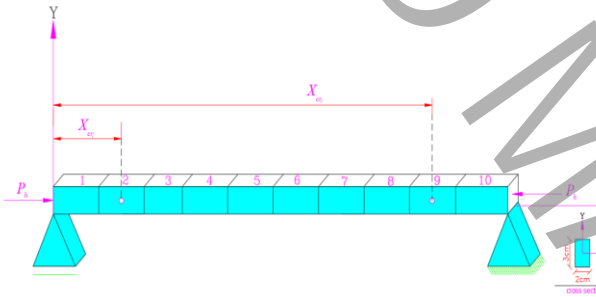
Shape and geometry of a simply supported beam-column and its cross section: case 1
